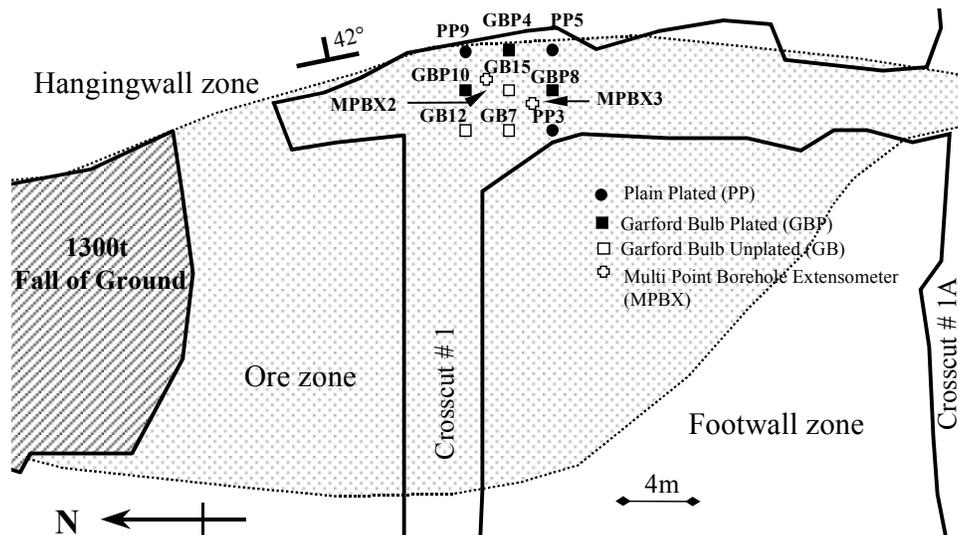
3: Schematic plan view of the Callinan test stope, East Zone, 1050m level, showing the geotechnical zones and the SMART instrumentation locations.
